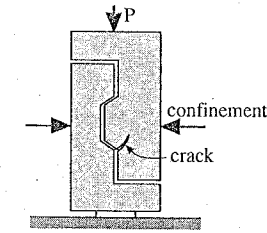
Specimen used in studying cracking in keyed joints in segmental box girder sections (after Buyukozturk, Bakhom and Beattie 1990).
